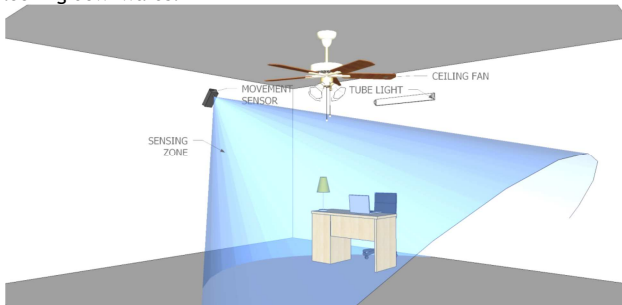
When mounting on the wall, mount inclined looking downwards, but as close to ceiling as possible for clear view
